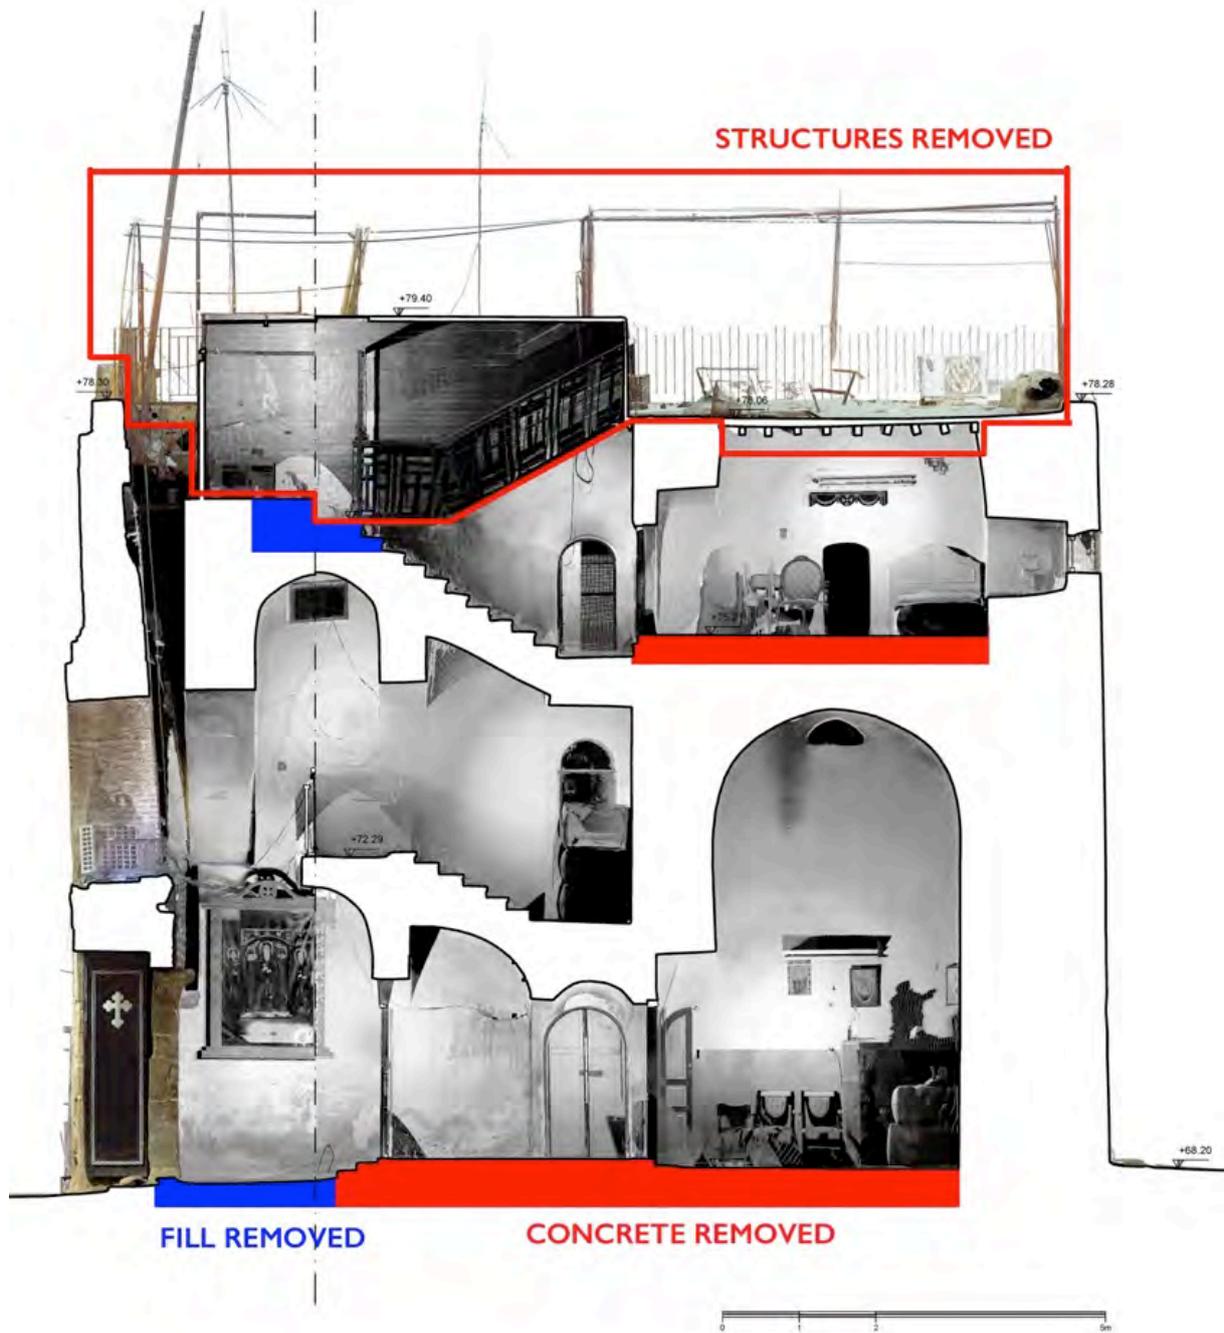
North-south section through tower and south portal looking east showing elements removed
